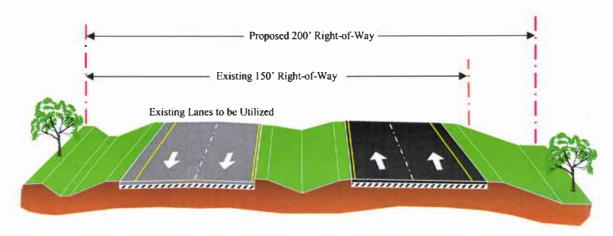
Proposed Existing Alignment Typical Section (Build Alternative 3)
